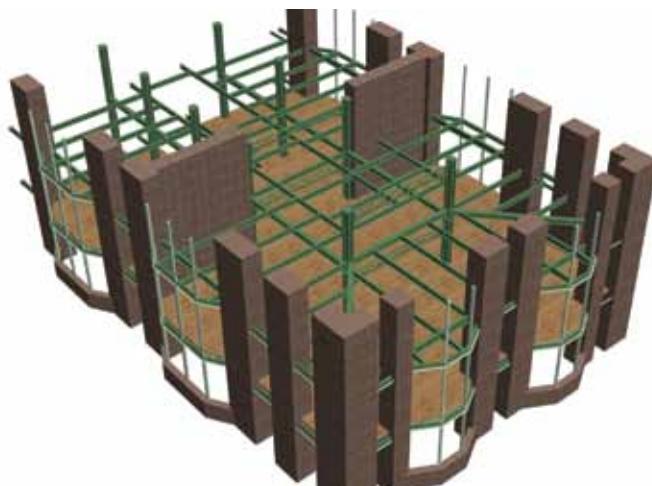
Structural plan of the 8th floor showing tie-rod layout for wind bracing, steel framing for floor structure (Drawing by the author based on Centre Canadien d'Architecture drawing DR1986:0767:052).
